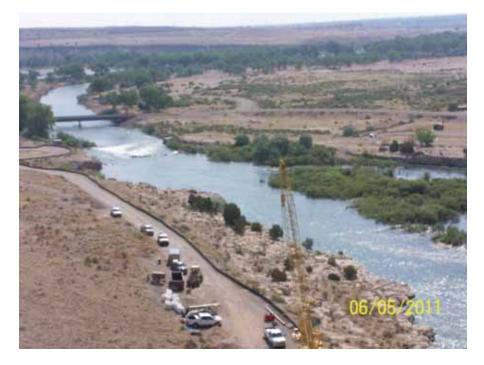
AVC Pueblo Dam Outlet Works Interconnect site. Photo taken from top of Pueblo Dam, looking east. Pipeline crossing approximately 150 feet upstream of Juniper Road bridge. Photo by Rodney Barthel
